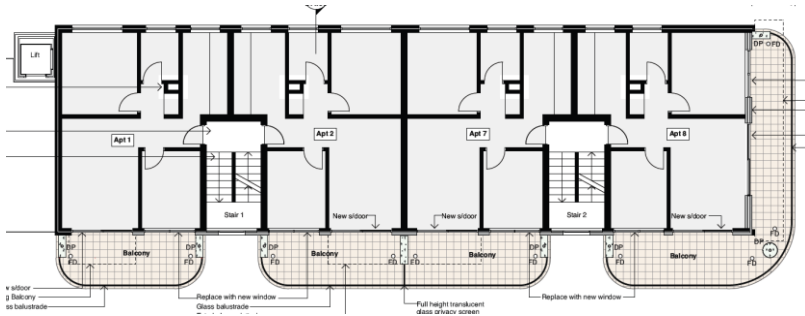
Proposed first-third floor plan in PL/39/2021 – 10 Major Street, Coogee (Source: Ken Powell Architect)
